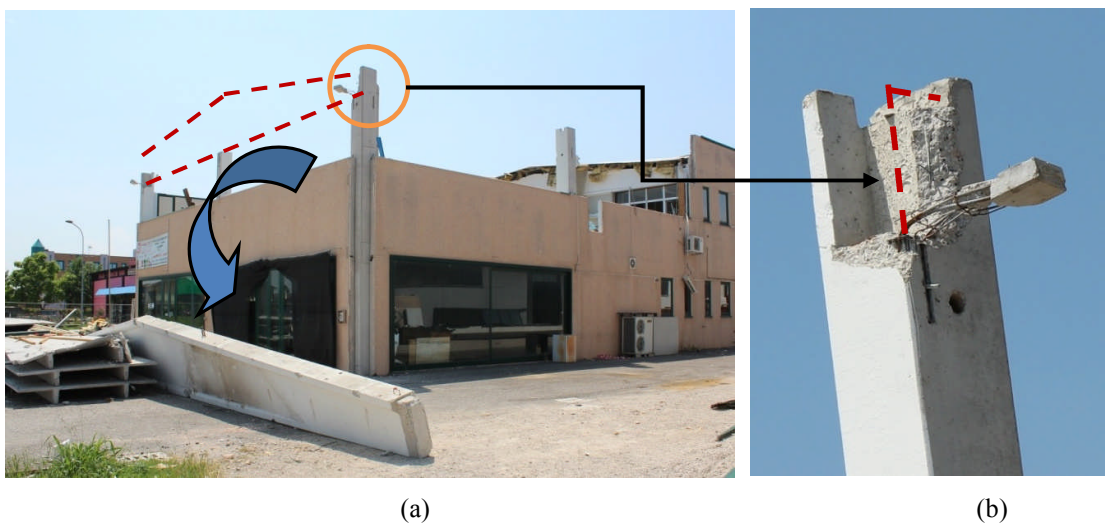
(a) Out-of-plane collapse of a double slope precast beam after unseating following failure of the lateral restraint of the fork at the seat pocket; (b) Detail of the shear failure of the fork.
